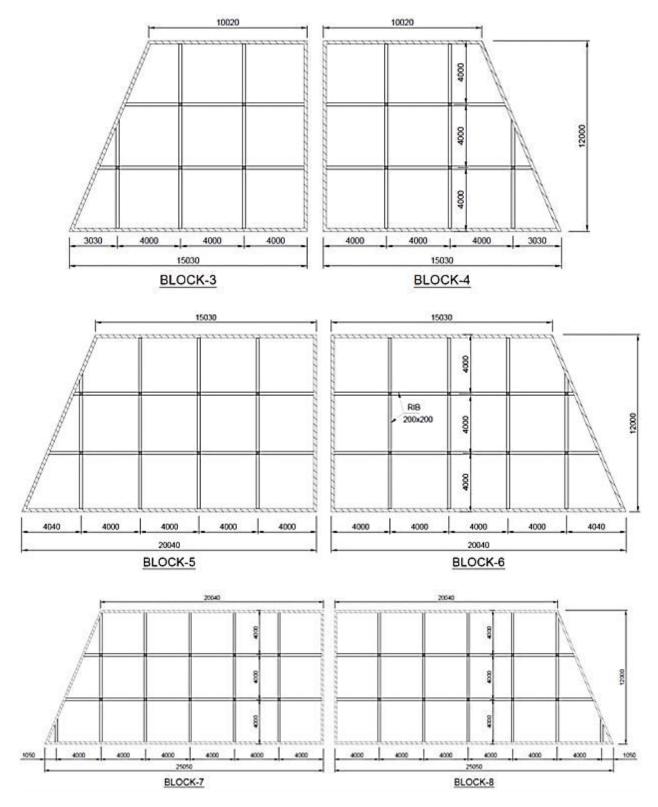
Concrete caisson blocks. Refer Figure 3.10 for the block sections. Note that the slab thickness is 200 mm
